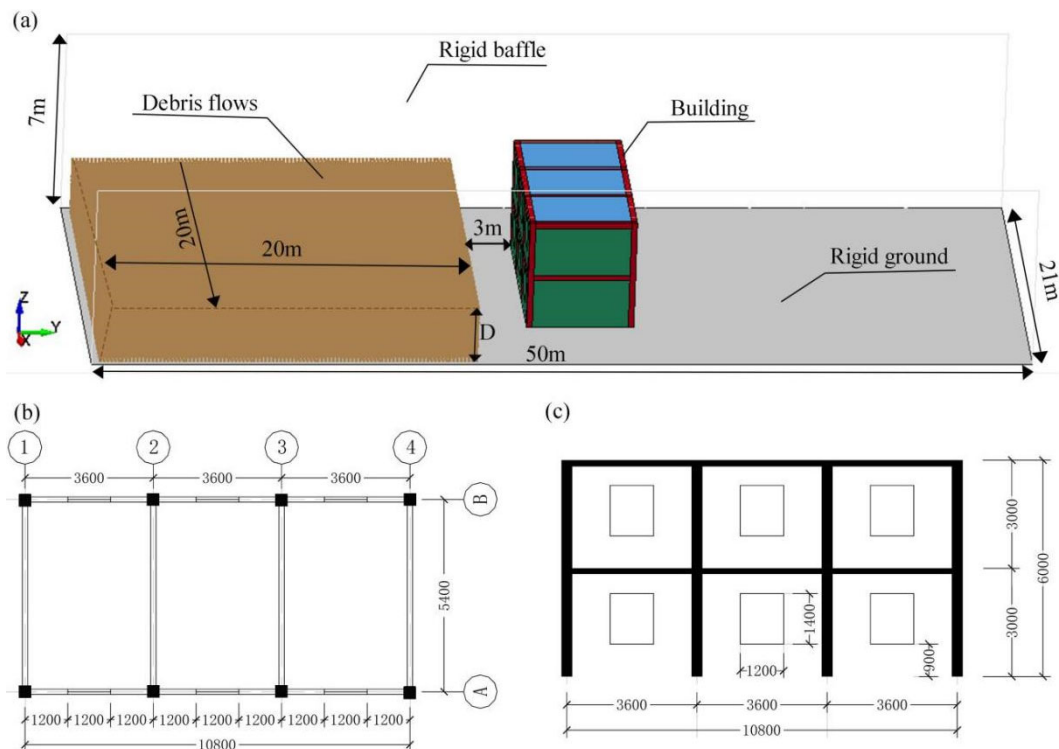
Numerical model: (a) global model; (b) top view of building model (unit: mm); (c) front view of building model (unit: mm).
